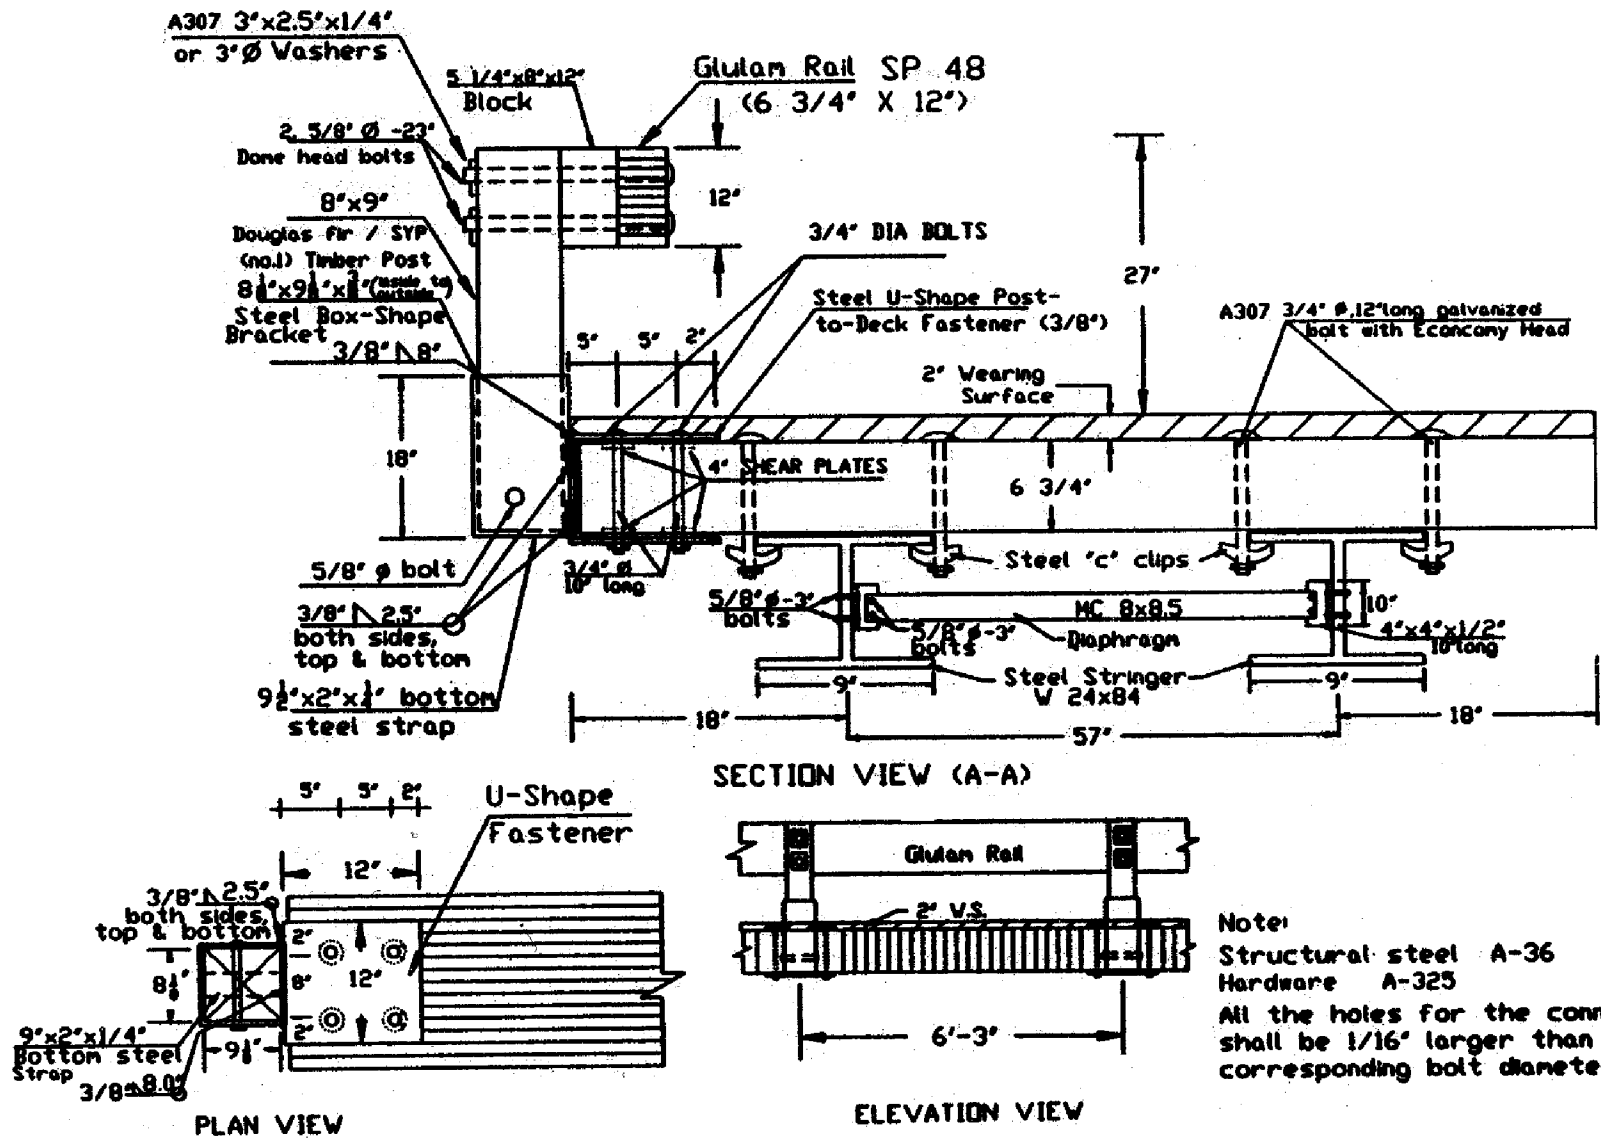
Timber Bridge Rail, System 1 (98,99).
